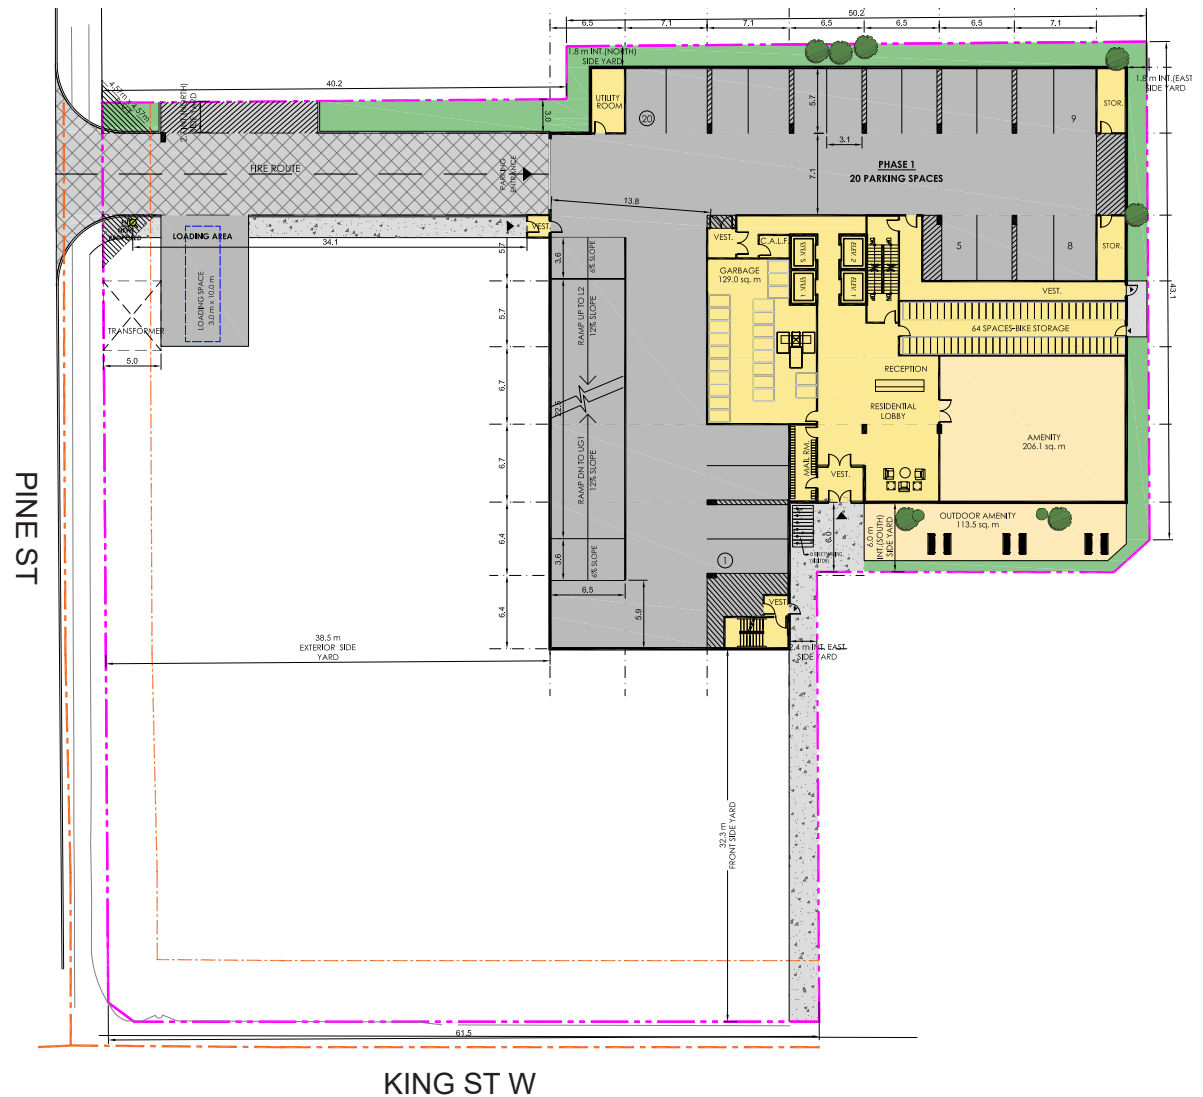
Proposed Ground Floor Plan (Reinders + Law, June 14, 2024)
